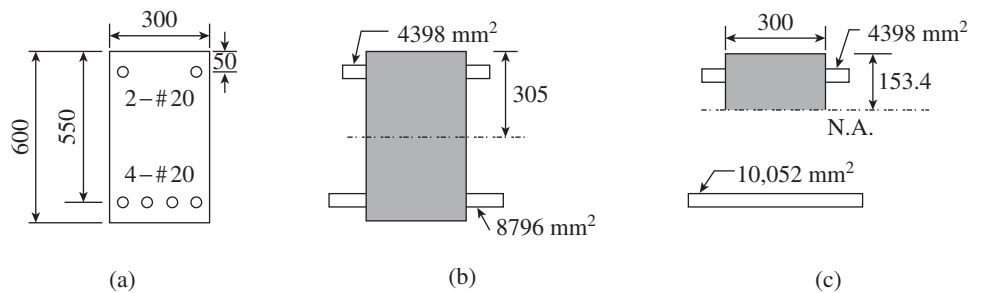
(a) Cross section (b) Uncracked transformed section (c) Cracked transformed section
